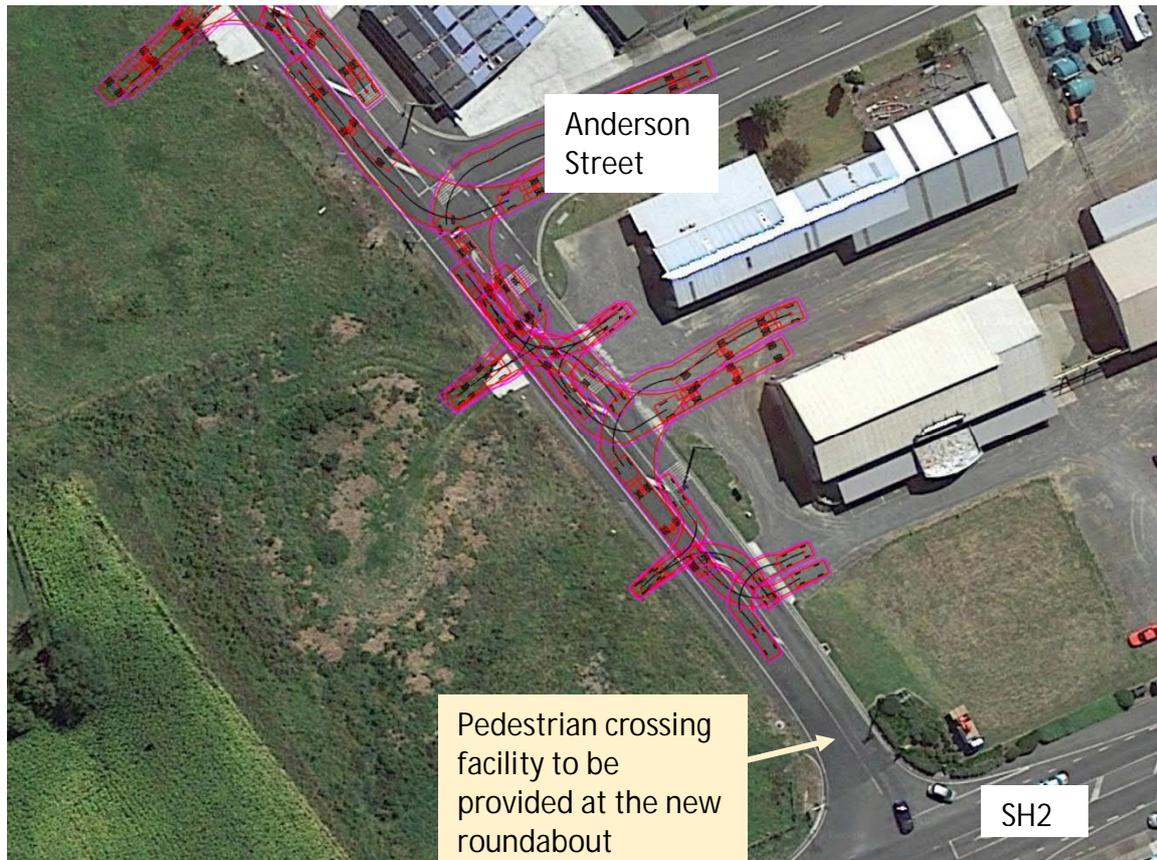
Avenue Road North pedestrian assessment – Anderson Street to SH26
